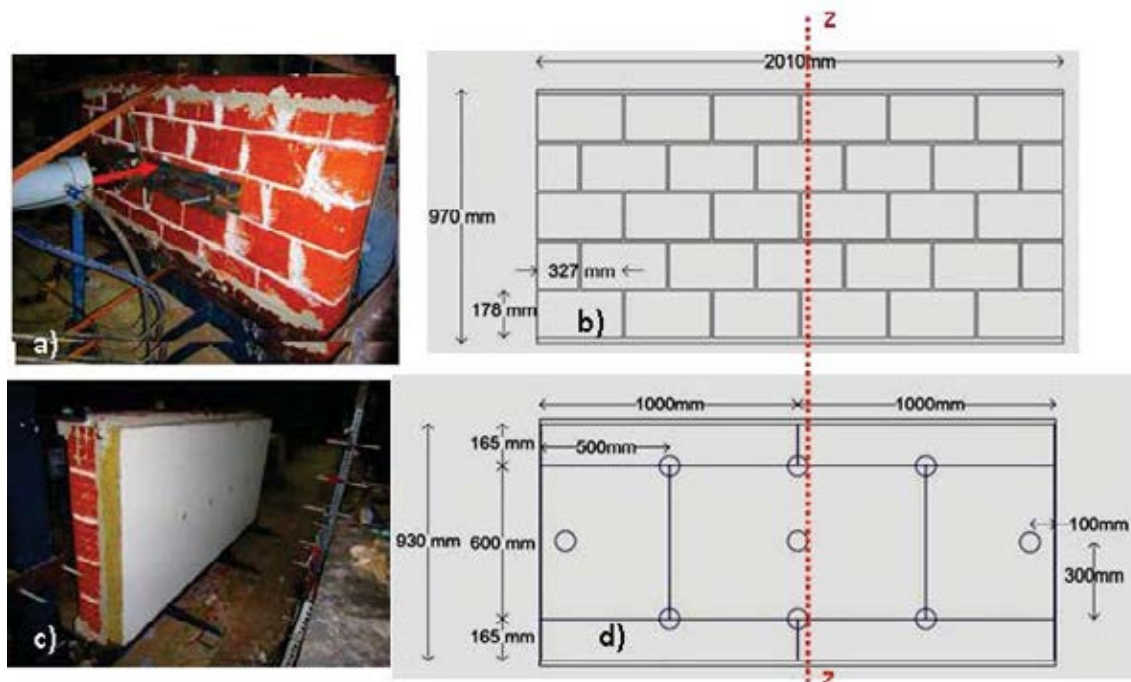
Out-of-plane flexure of a masonry wallets. a) and b) View from the brick façade. c) and d) View from the thermo-insulating (mineral wool) façade. The circles indicate the location of the anchors.
